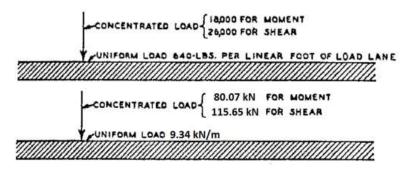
CSA S6-66 Lane Loading
